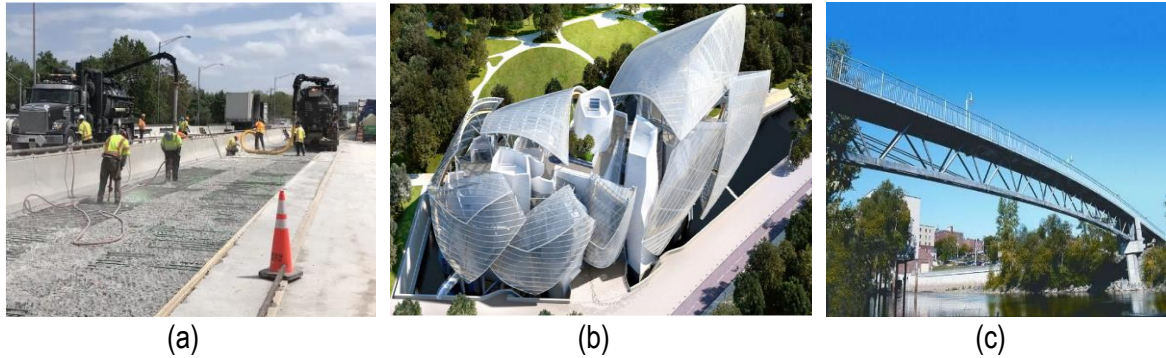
(a) UHPC overlay on a bridge, USA, (b) Fondation Louis Vuitton, Paris, France, (c) Pedestrian bridge in Sherbrook, Canada.
